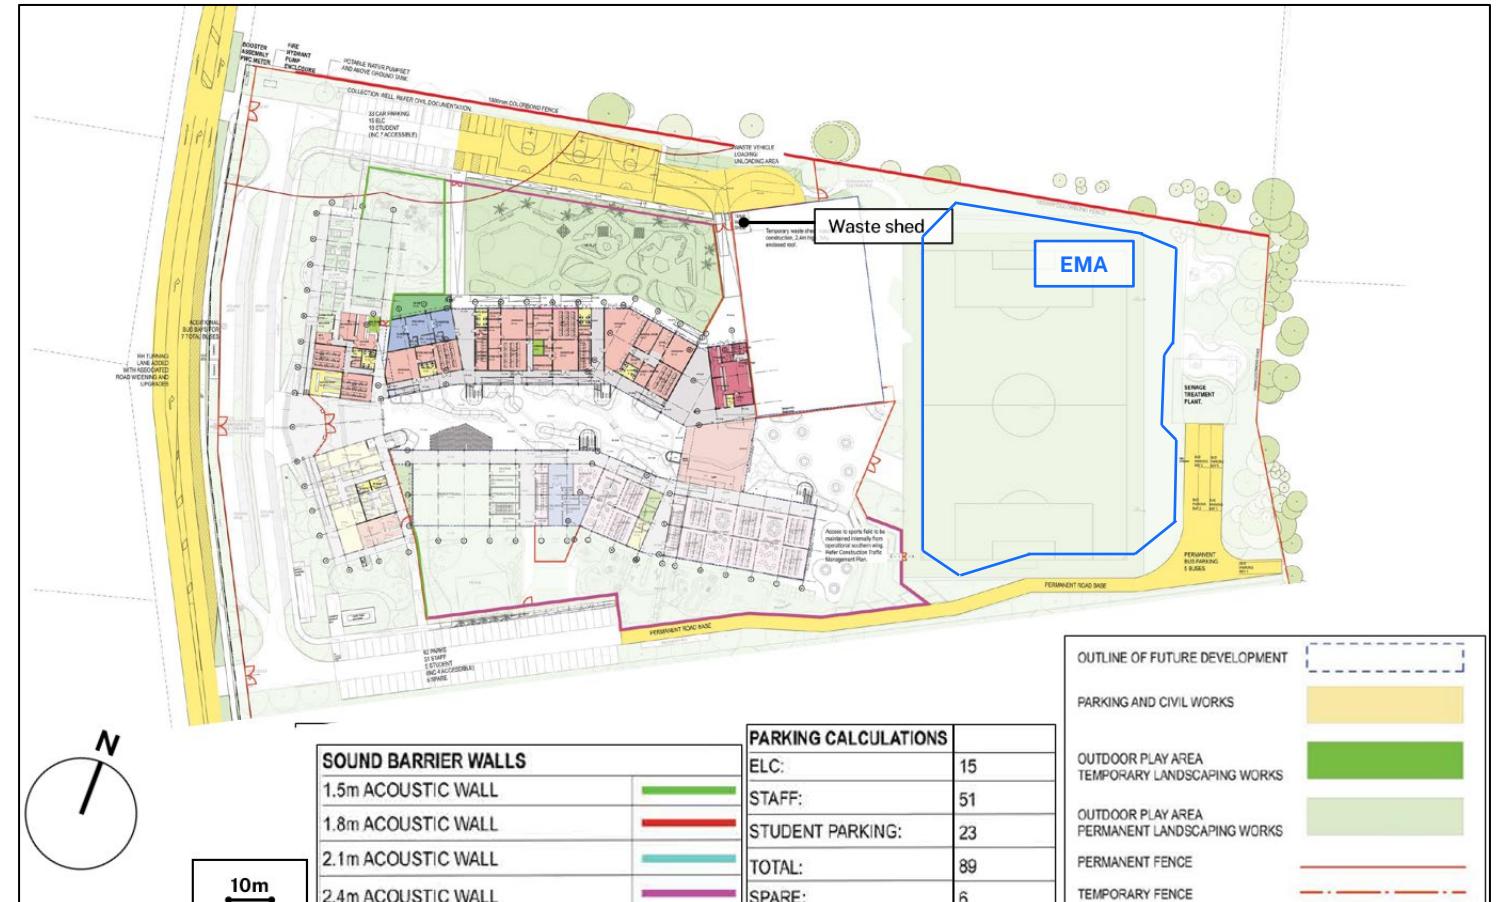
Ground Floor Plan (Source: Applicant's ARtS, 2025)
